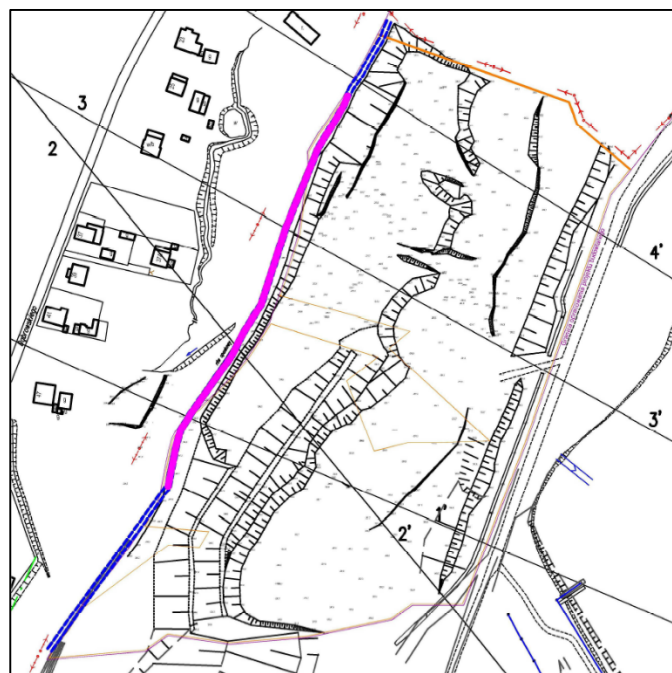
Location of ditch failure with a section of 300 m long, marked in pink.
